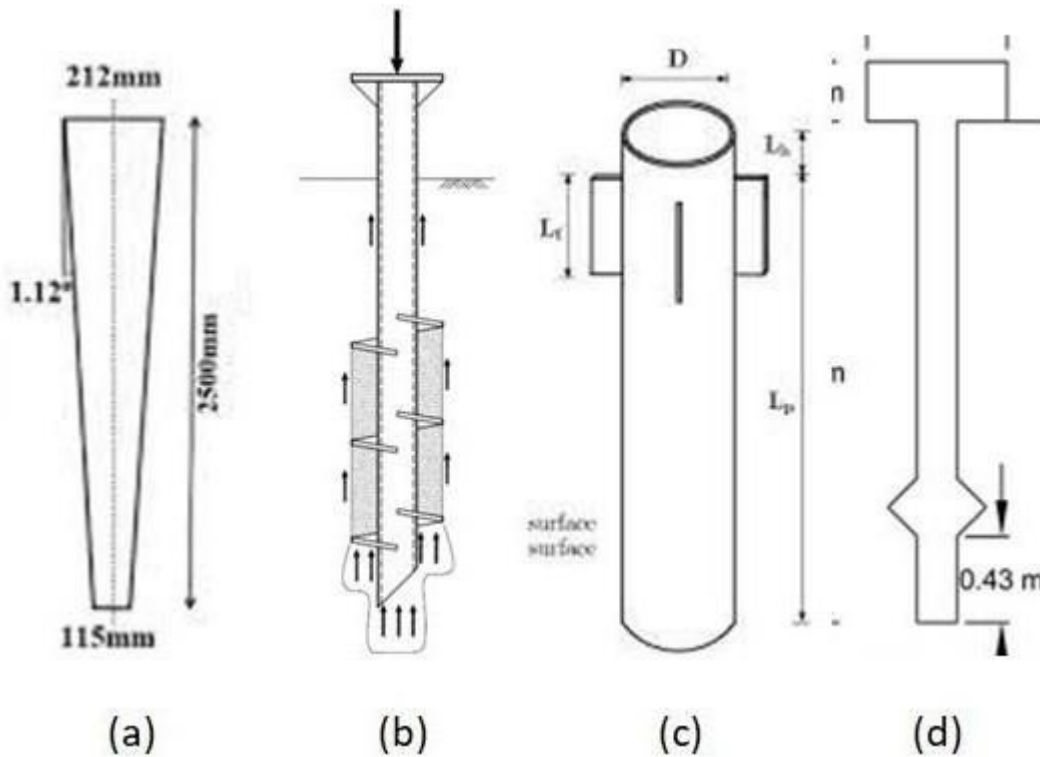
Different types of pile foundation (a) Tapered pile; (b) Screw pile;(c) Finned pile; (d)Under-reamed pile(Source: civilknowledge.com)
